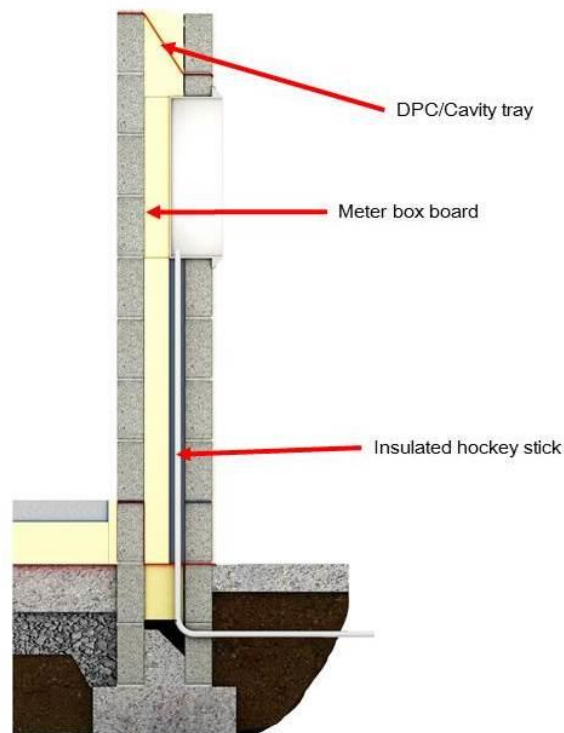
Unilin CavityTherm Meter Box Board Cross-section Including Typical DPC/Cavity Tray Installation Detail.
